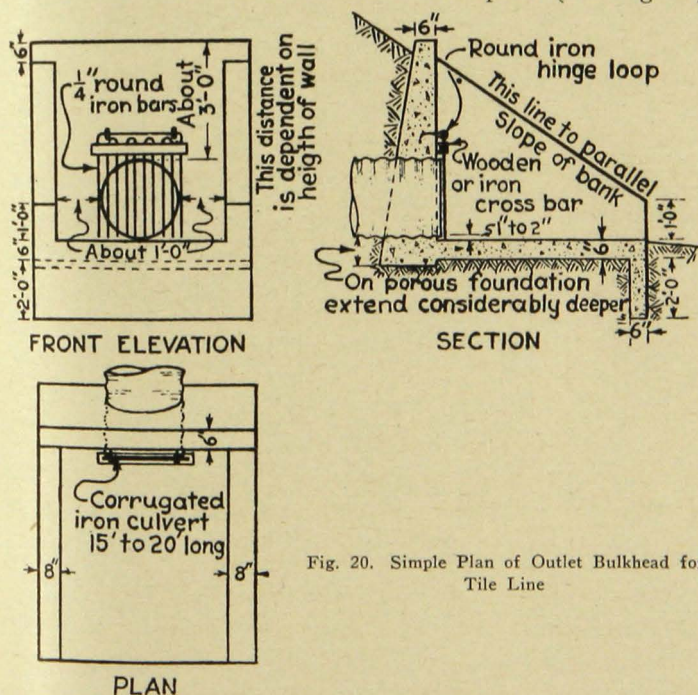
Simple Plan of Outlet Bulkhead for Tile Line
